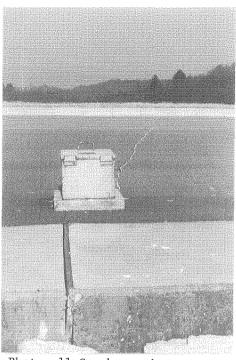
Crack running across asphalt pavement at the top of dam from a piezometer box
